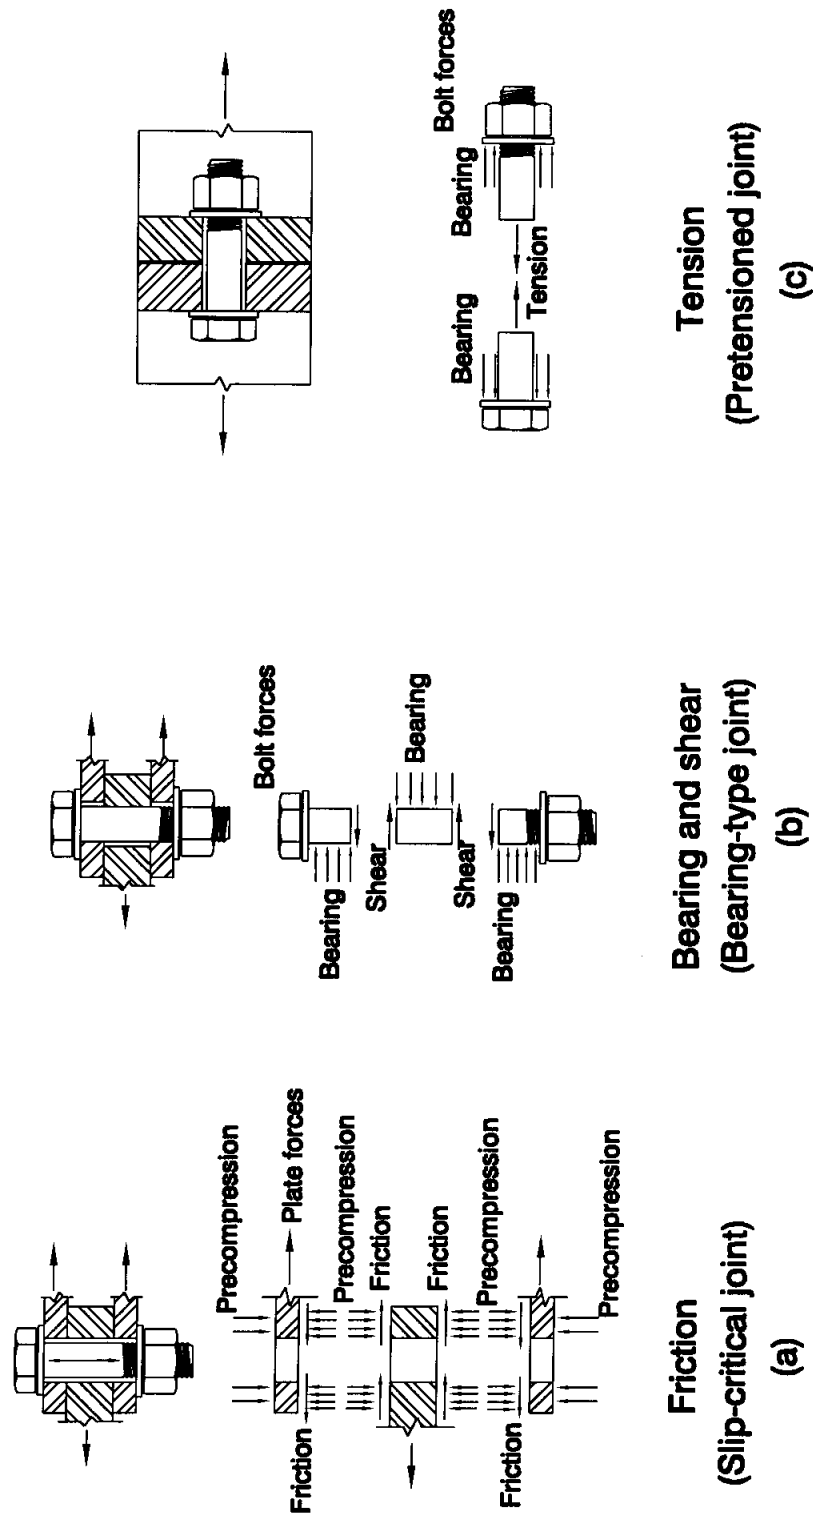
Force transfer mechanisms in bolted joints.
